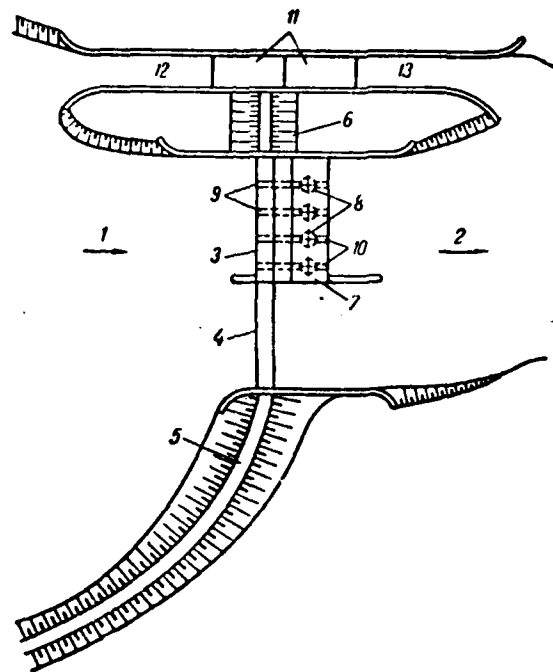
Diagram of near-dam hydroelectric power plant. 1 - headwater; 2 - the lower reach; 3 - dead/blind concrete dam; 4 - spillway concrete dam; 5 and 6 - earth dams; 7 - building of the station; 8 - hydroturbine; 9 - pressurized pipelines; 10 - suction tubes; 11 - two-chamber sluice; 12 and 13 - approach channels.
